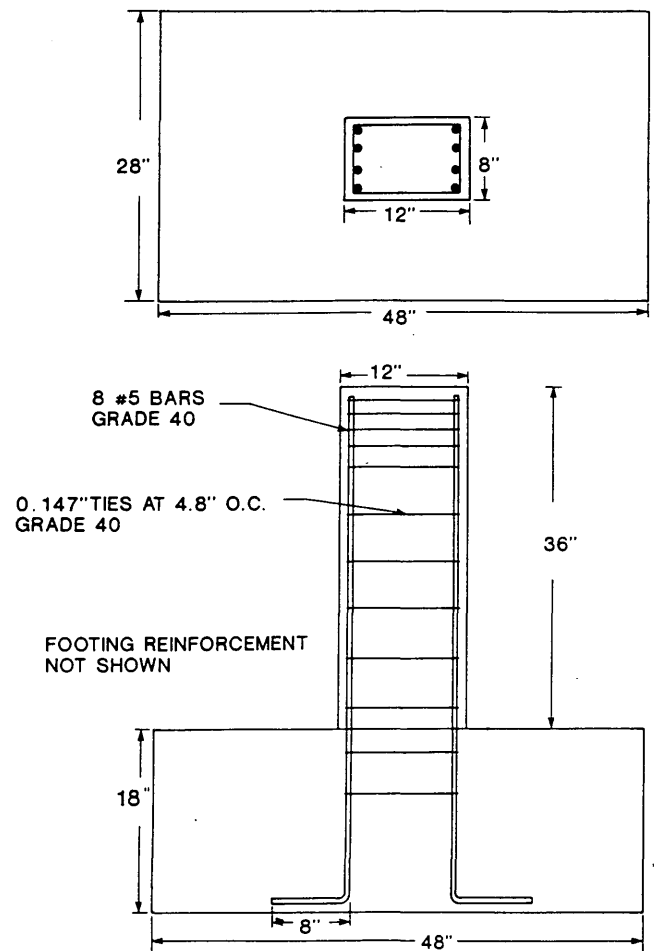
Column control specimen: top, plan view; bottom, elevation view.
